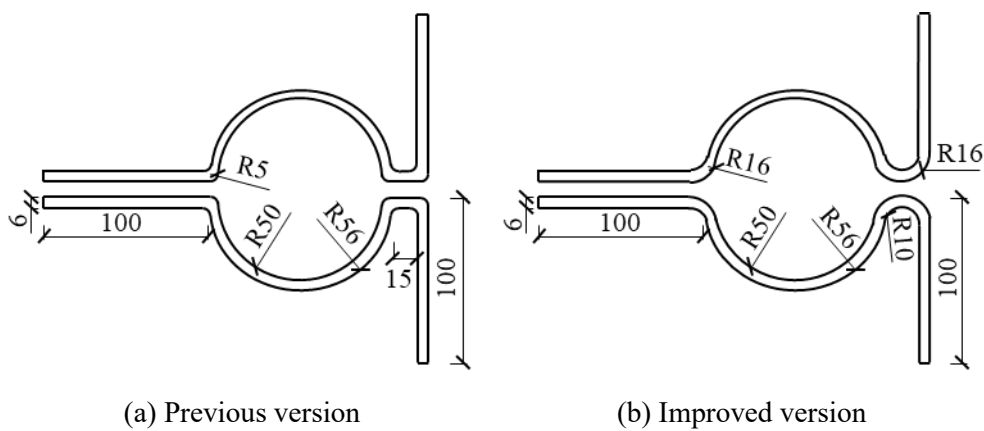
Dimensions of the two versions of connection (all dimensions in mm)
